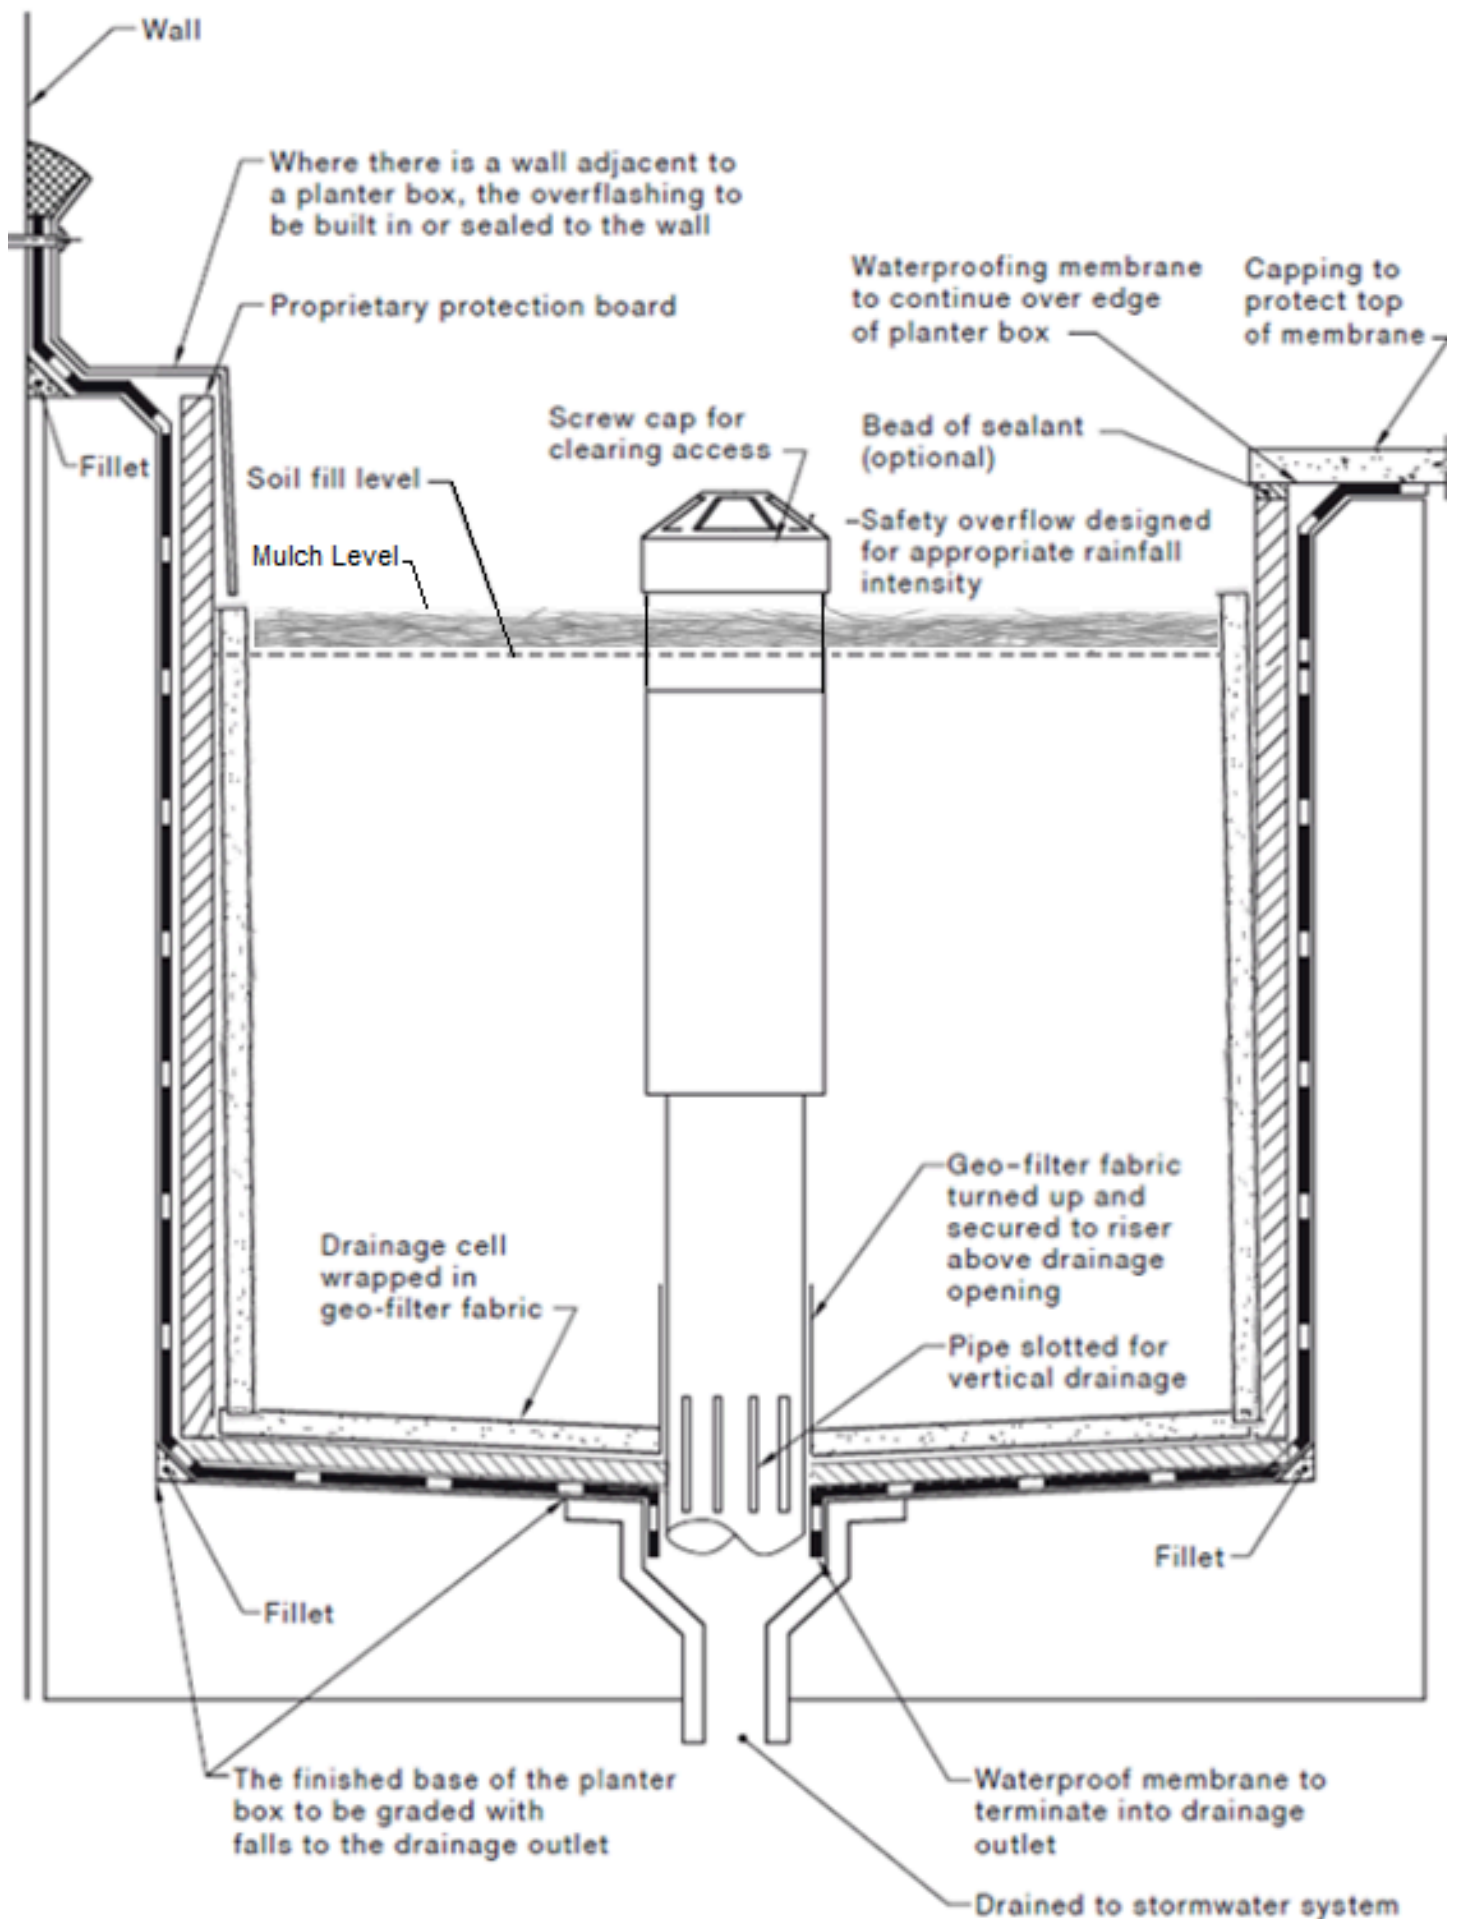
TYPICAL PLANTER BOX CONSTRUCTION
